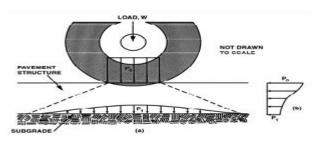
Stress distribution through flexible pavement structure (Gupta, et al.,
